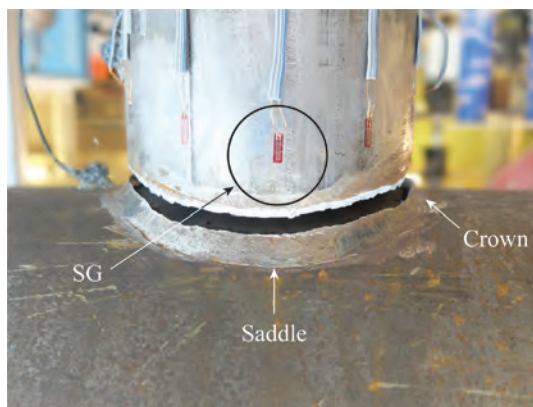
Weld fracture in a 90° cross-connection.
